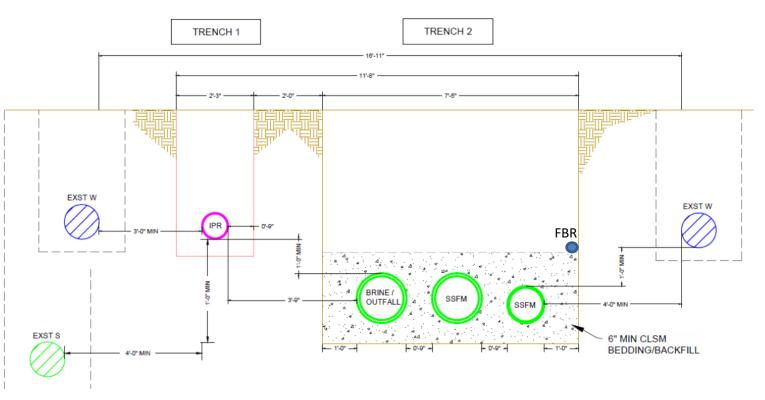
Proposed Compact Trench Section with DDW Waiver
